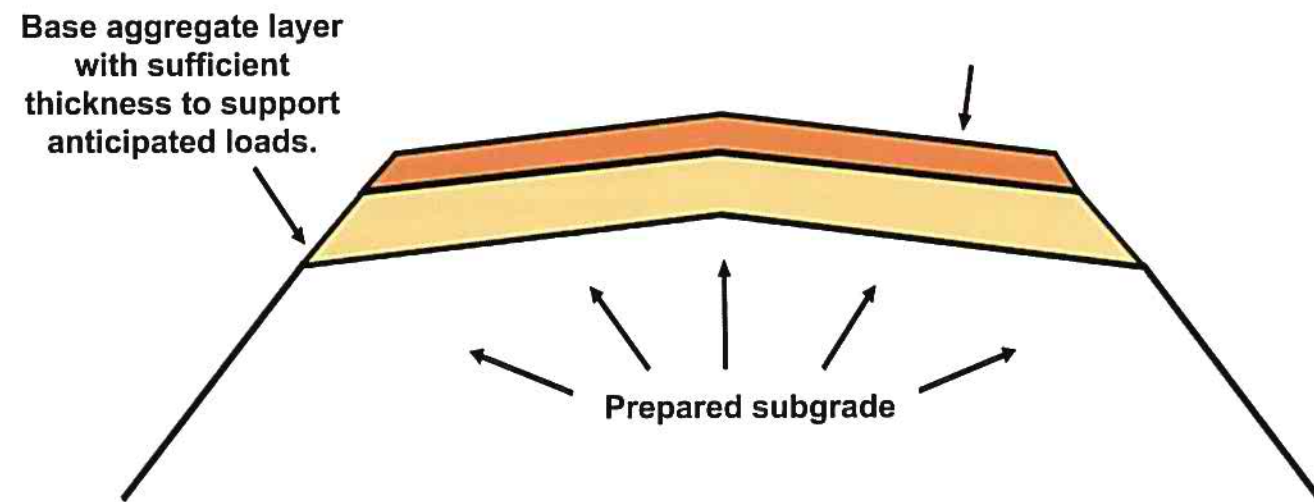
Roadway Layers: Example of building base and surface layers on a reconstructed gravel road. This may not be affordable, but will serve very well if significant truck traffic is expected.
